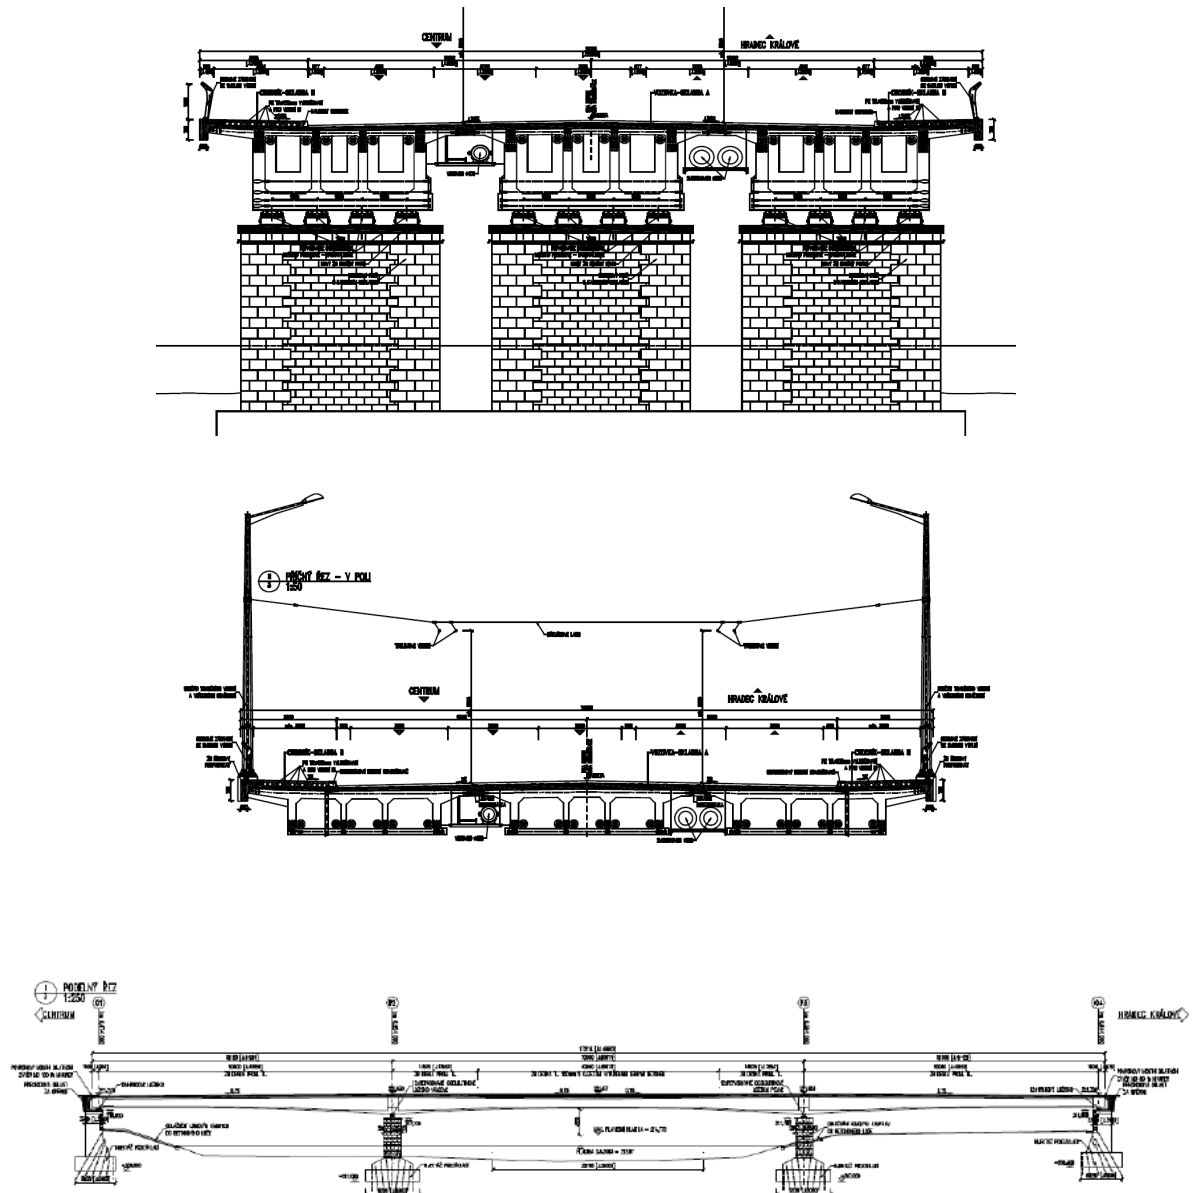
Dimensions of the bridge: drawing of cross section near the pillars, (top picture), mid-span cross section, (middle picture), and side (longitudinal) view of the bridge, (bottom picture) [11]
